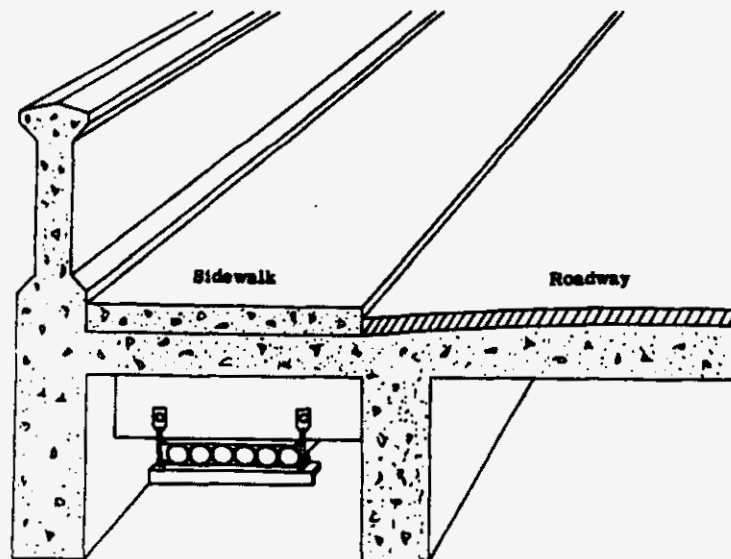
Conduit Installed by Hanging Under Sidewalk Portion of Bridge.
